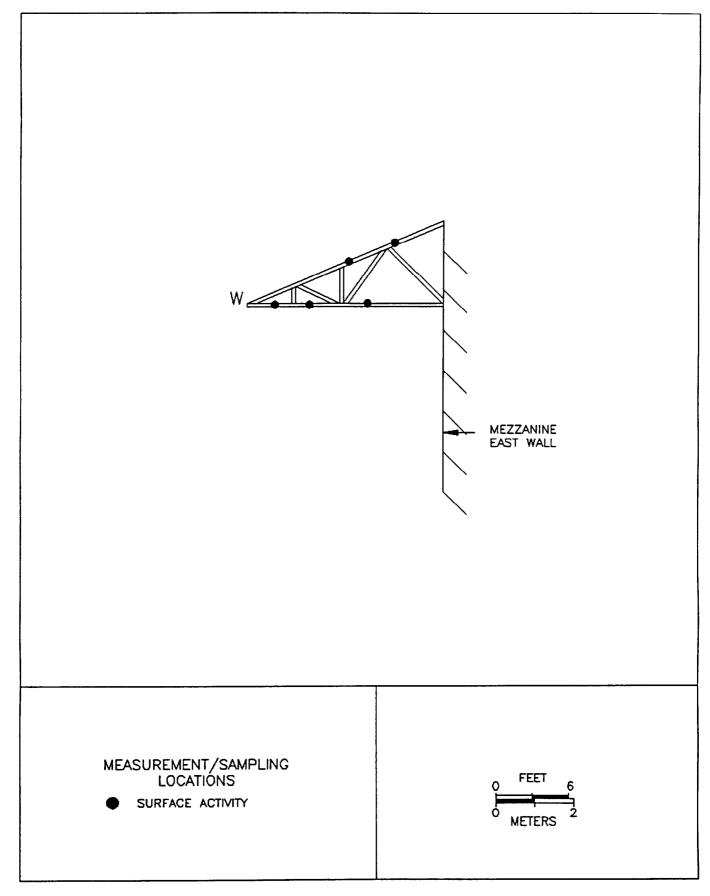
Building 8, Mezzanine, Truss 2 — Measurement and Sampling Locations
